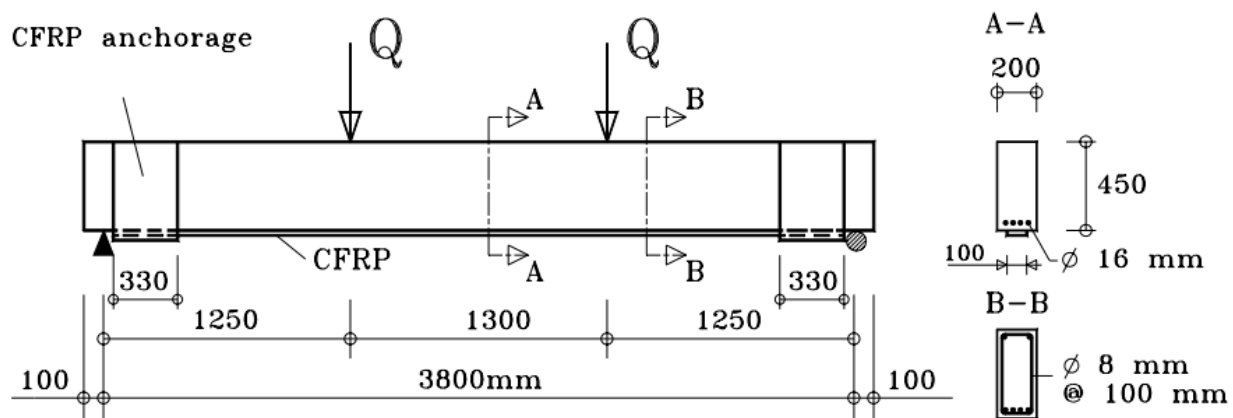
Test set-up and specimen dimension of End anchored validation beam
